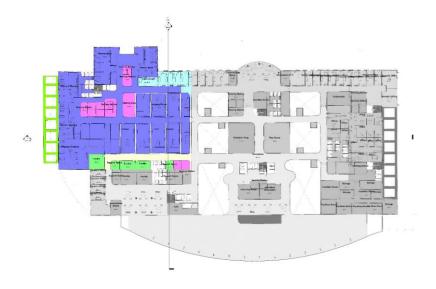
Cancer Therapy Zone Floor Plan (Image credit by the author)
